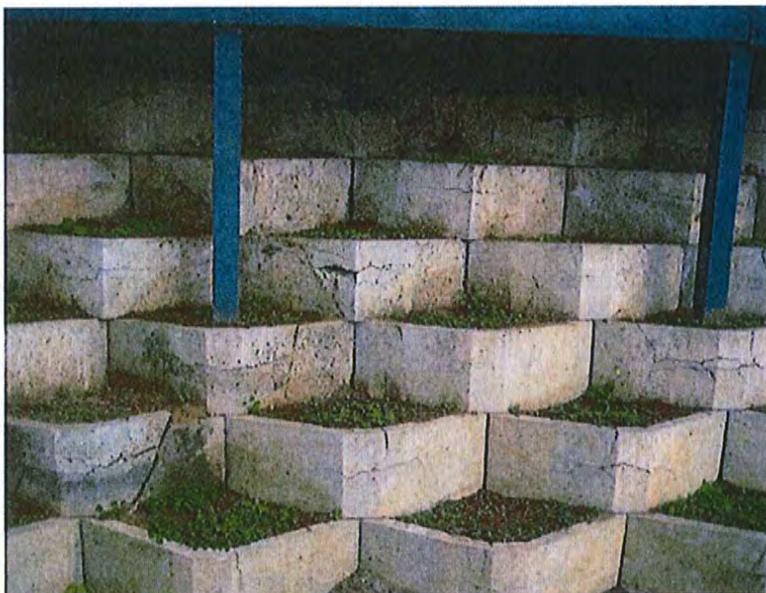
4x4 posts that support deck; founded in cell fill of modular retaining structure. Cracks can be seen in modular units; upper center unit is broken
